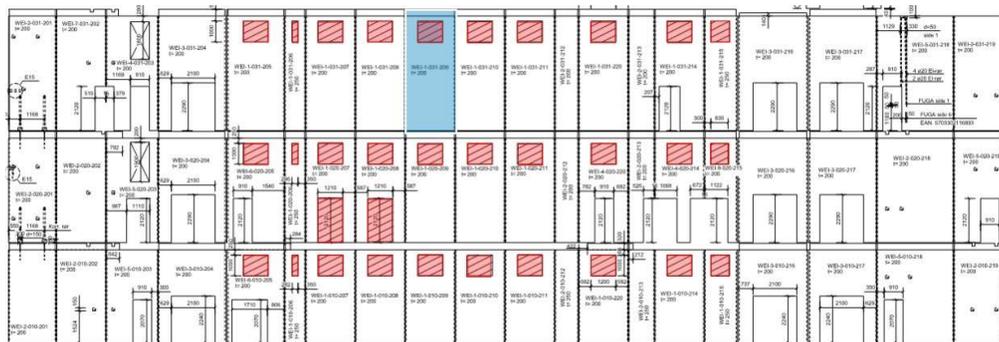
Pharma Building Case. Wall elevation from the Rambøll project material. The red hatched areas marks the boreholes.
